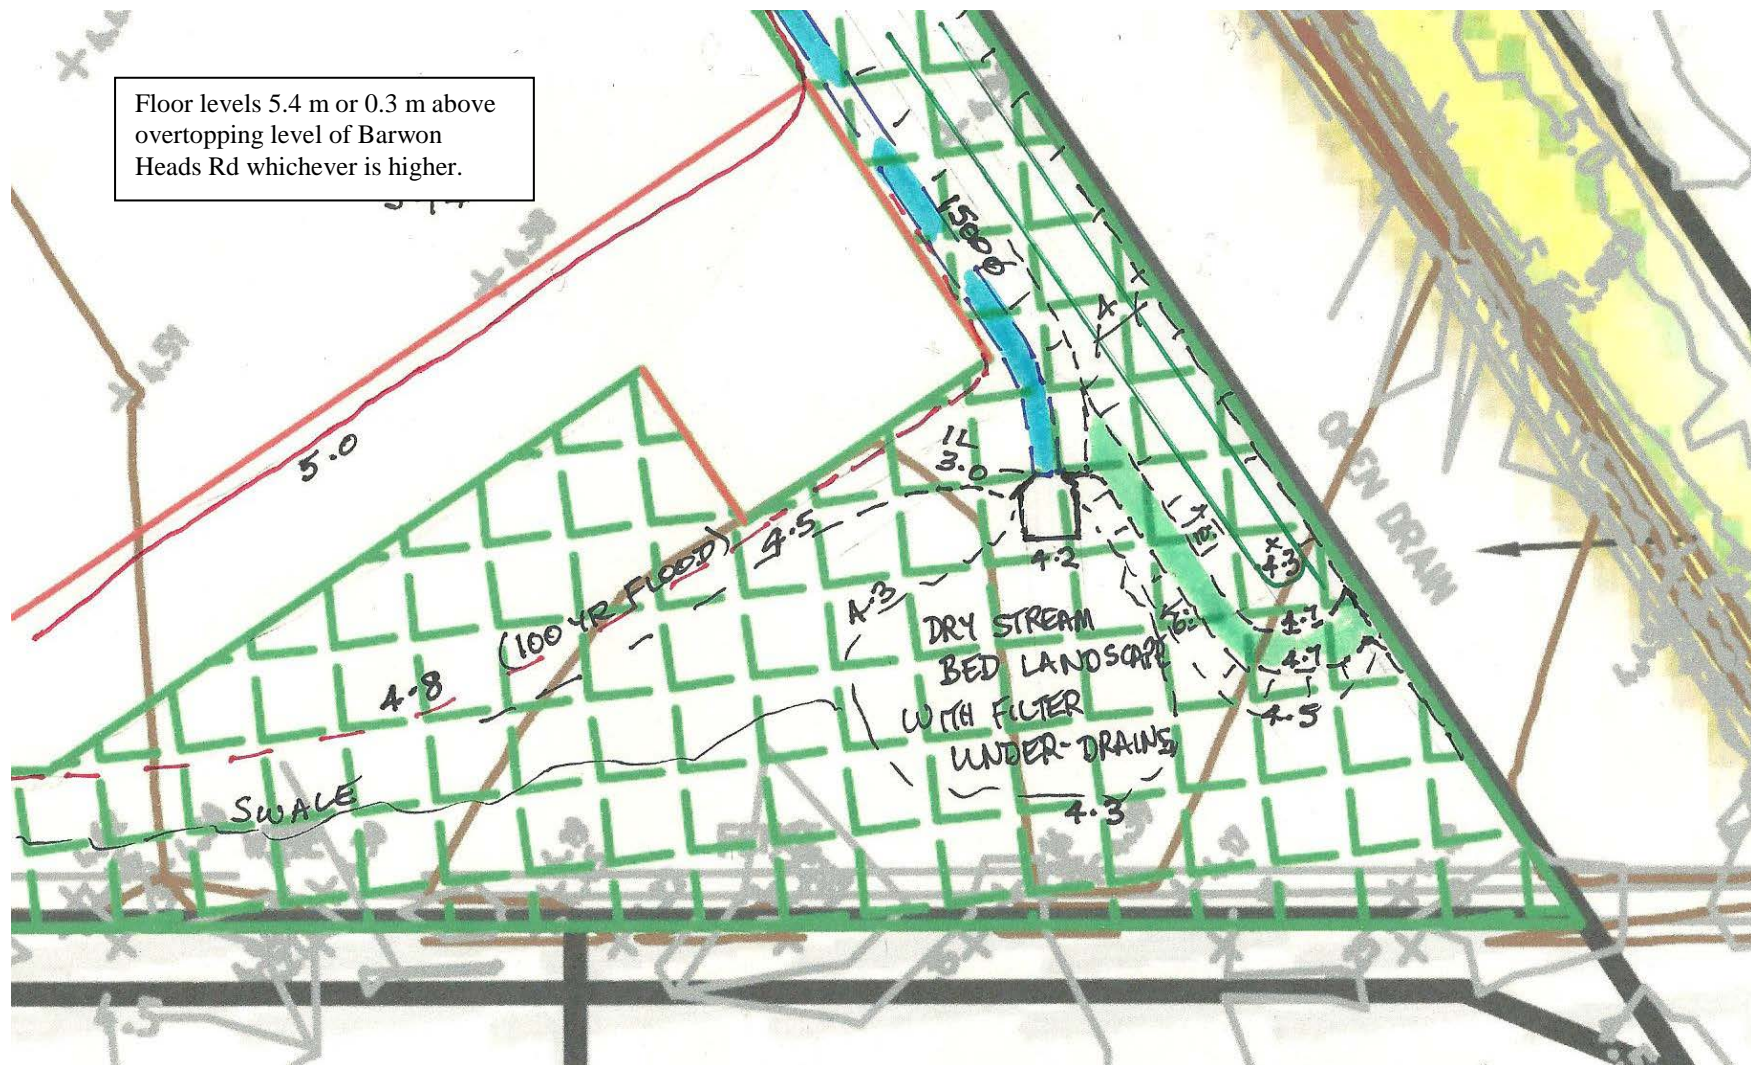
Proposed concept for pipe and channel intake in southeast corner of C301
